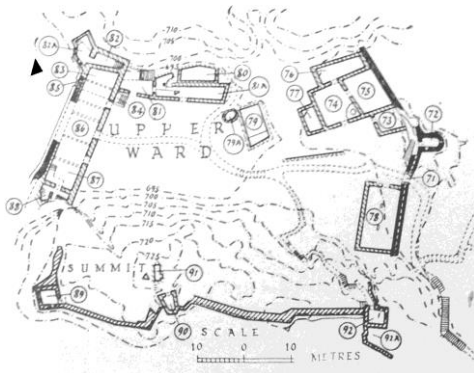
Department of Antiquities Plan, detail showing the postern n. 83 (Megaw, 1963).
